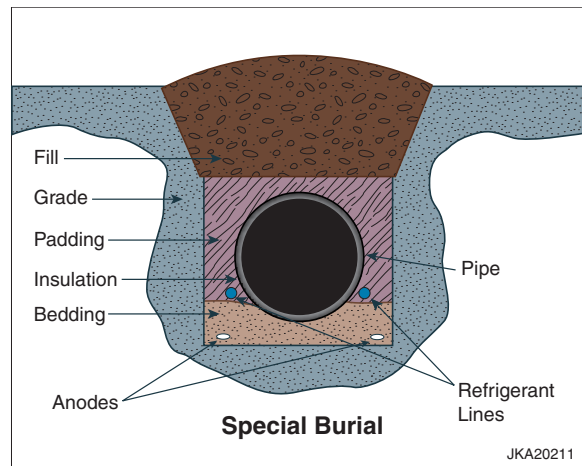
Typical Pipeline Details for Special Burial (Source: TAPS Owners 2001a, Figure 4.2-3)
